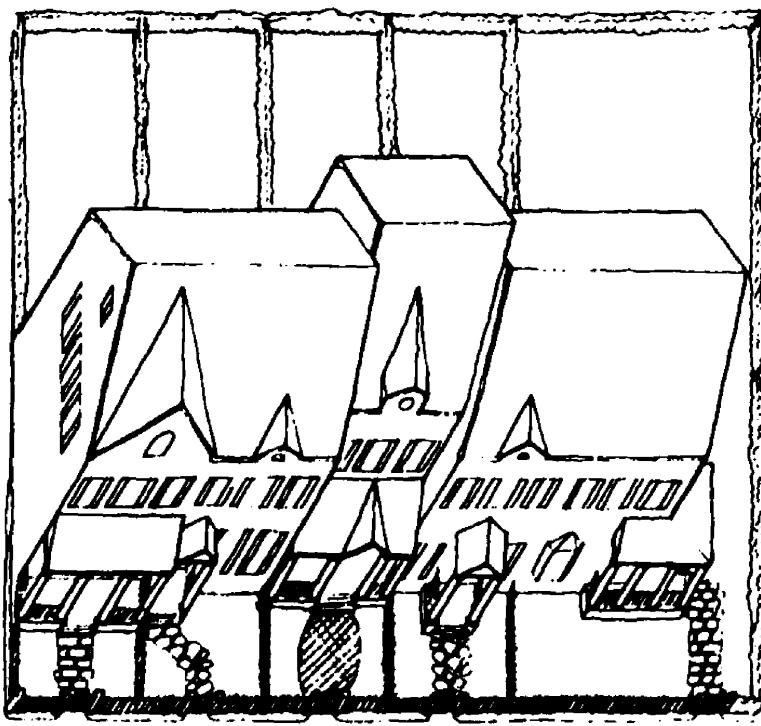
Long building walls and rooflines should be offset to provide interest and variety. The photograph illustrates building wall offsets in the Village of Lititz, Pennsylvania.
